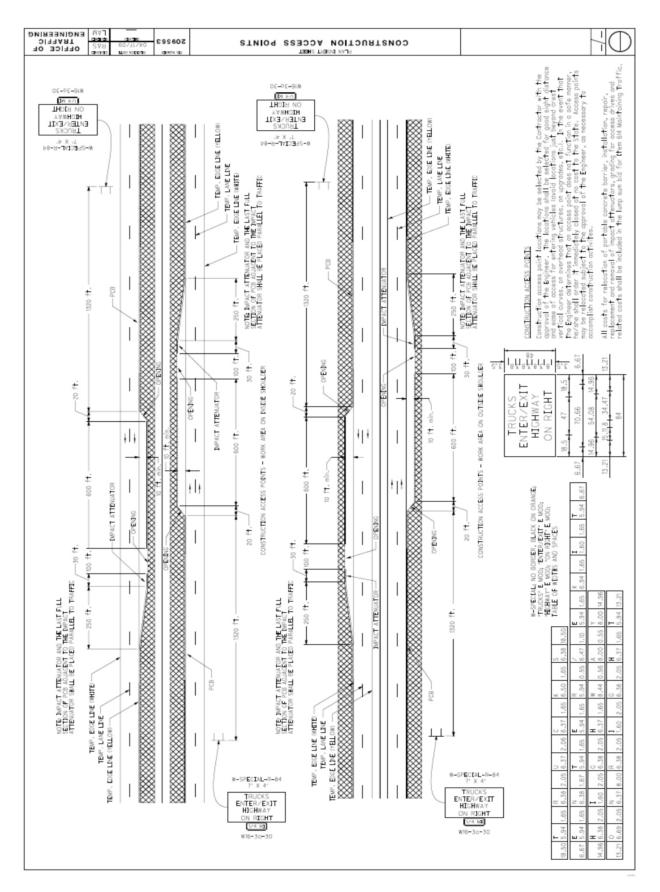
Construction access design detail sheet developed by Ohio DOT
